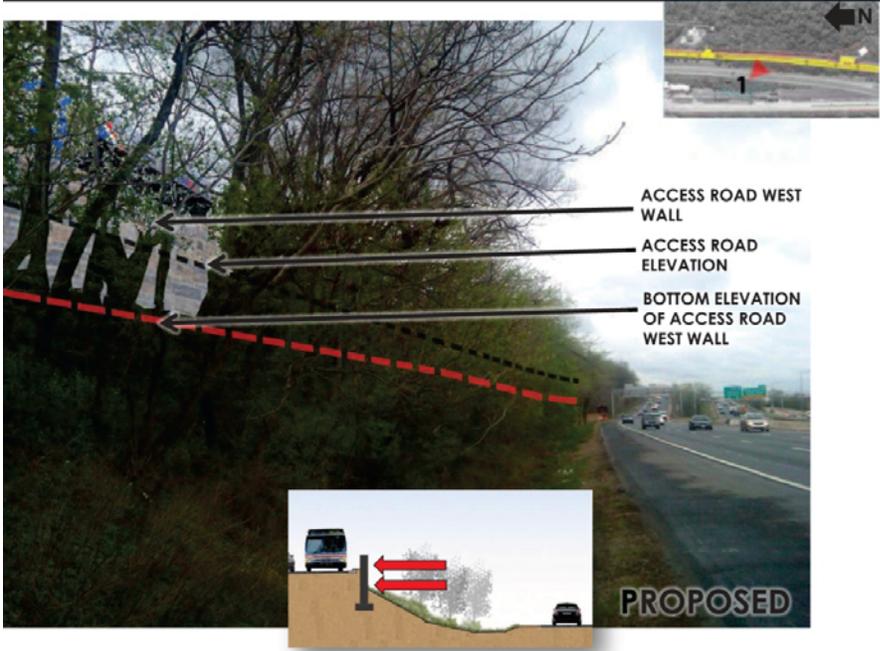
Existing and Proposed images of the access road impact along I-295. Looking south from I-295 north bound.
